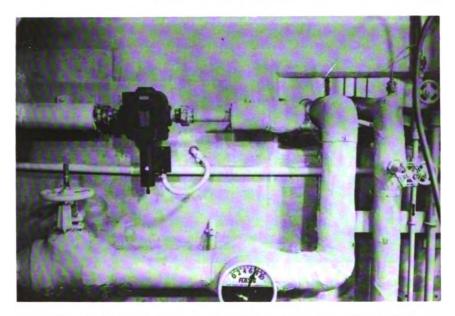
Swinging gate type meter (bottom) in water supply to turbine guide bearing and runner seals with vane-type indicating meter (above) in water supply to generator bearing oil coolers—Chatuge.
